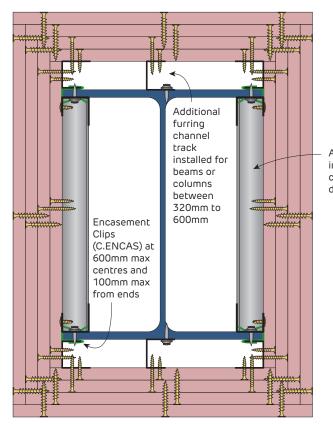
4 Sided Protection for I-Beam/Column Plan or Section
